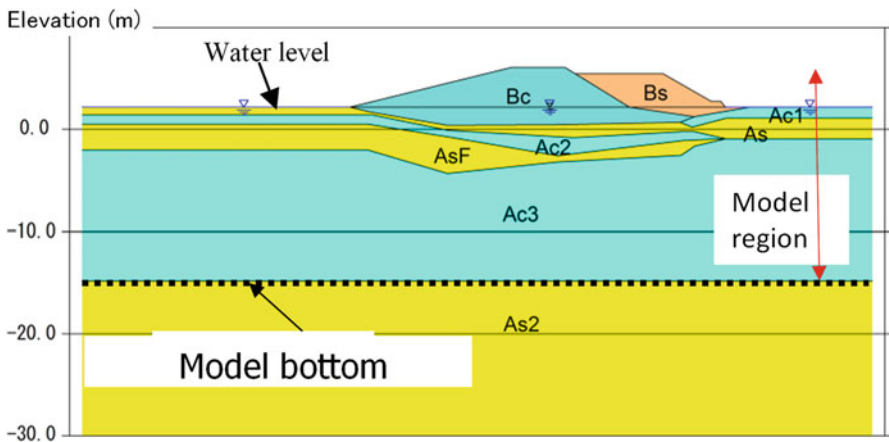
Profile of the embankment and the foundation ground (Site A) (Japan Institute of Country-ology and Engineering (JICE) 2011)
